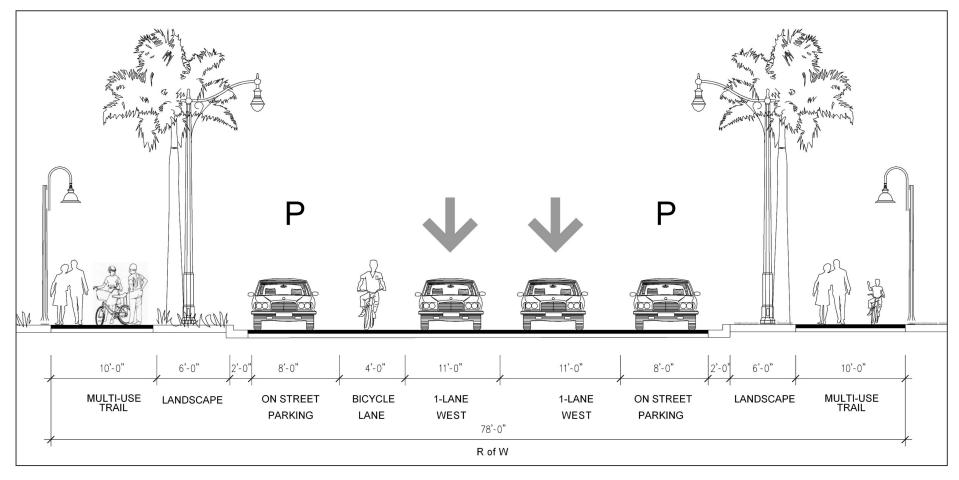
Typical Cross-section on the JFK Causeway in North Bay Village Alternative 1 and Hybrid Alternative
